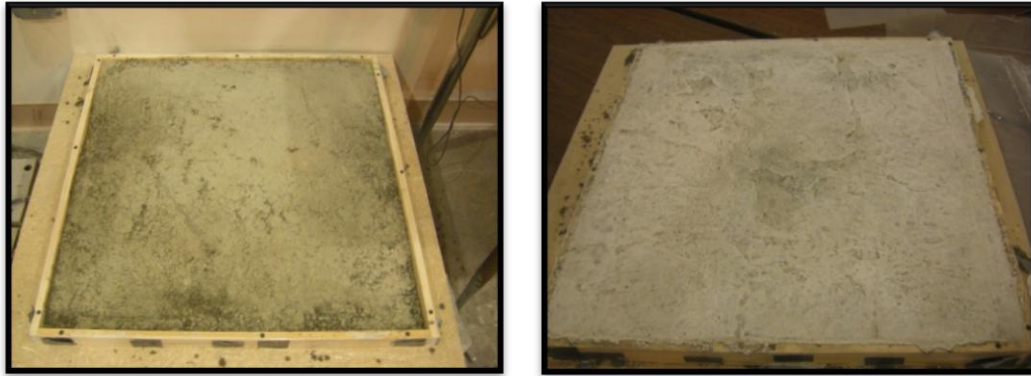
Placing PVA Fiber Reinforced Concrete (Left) and Harden Mold (Right)
